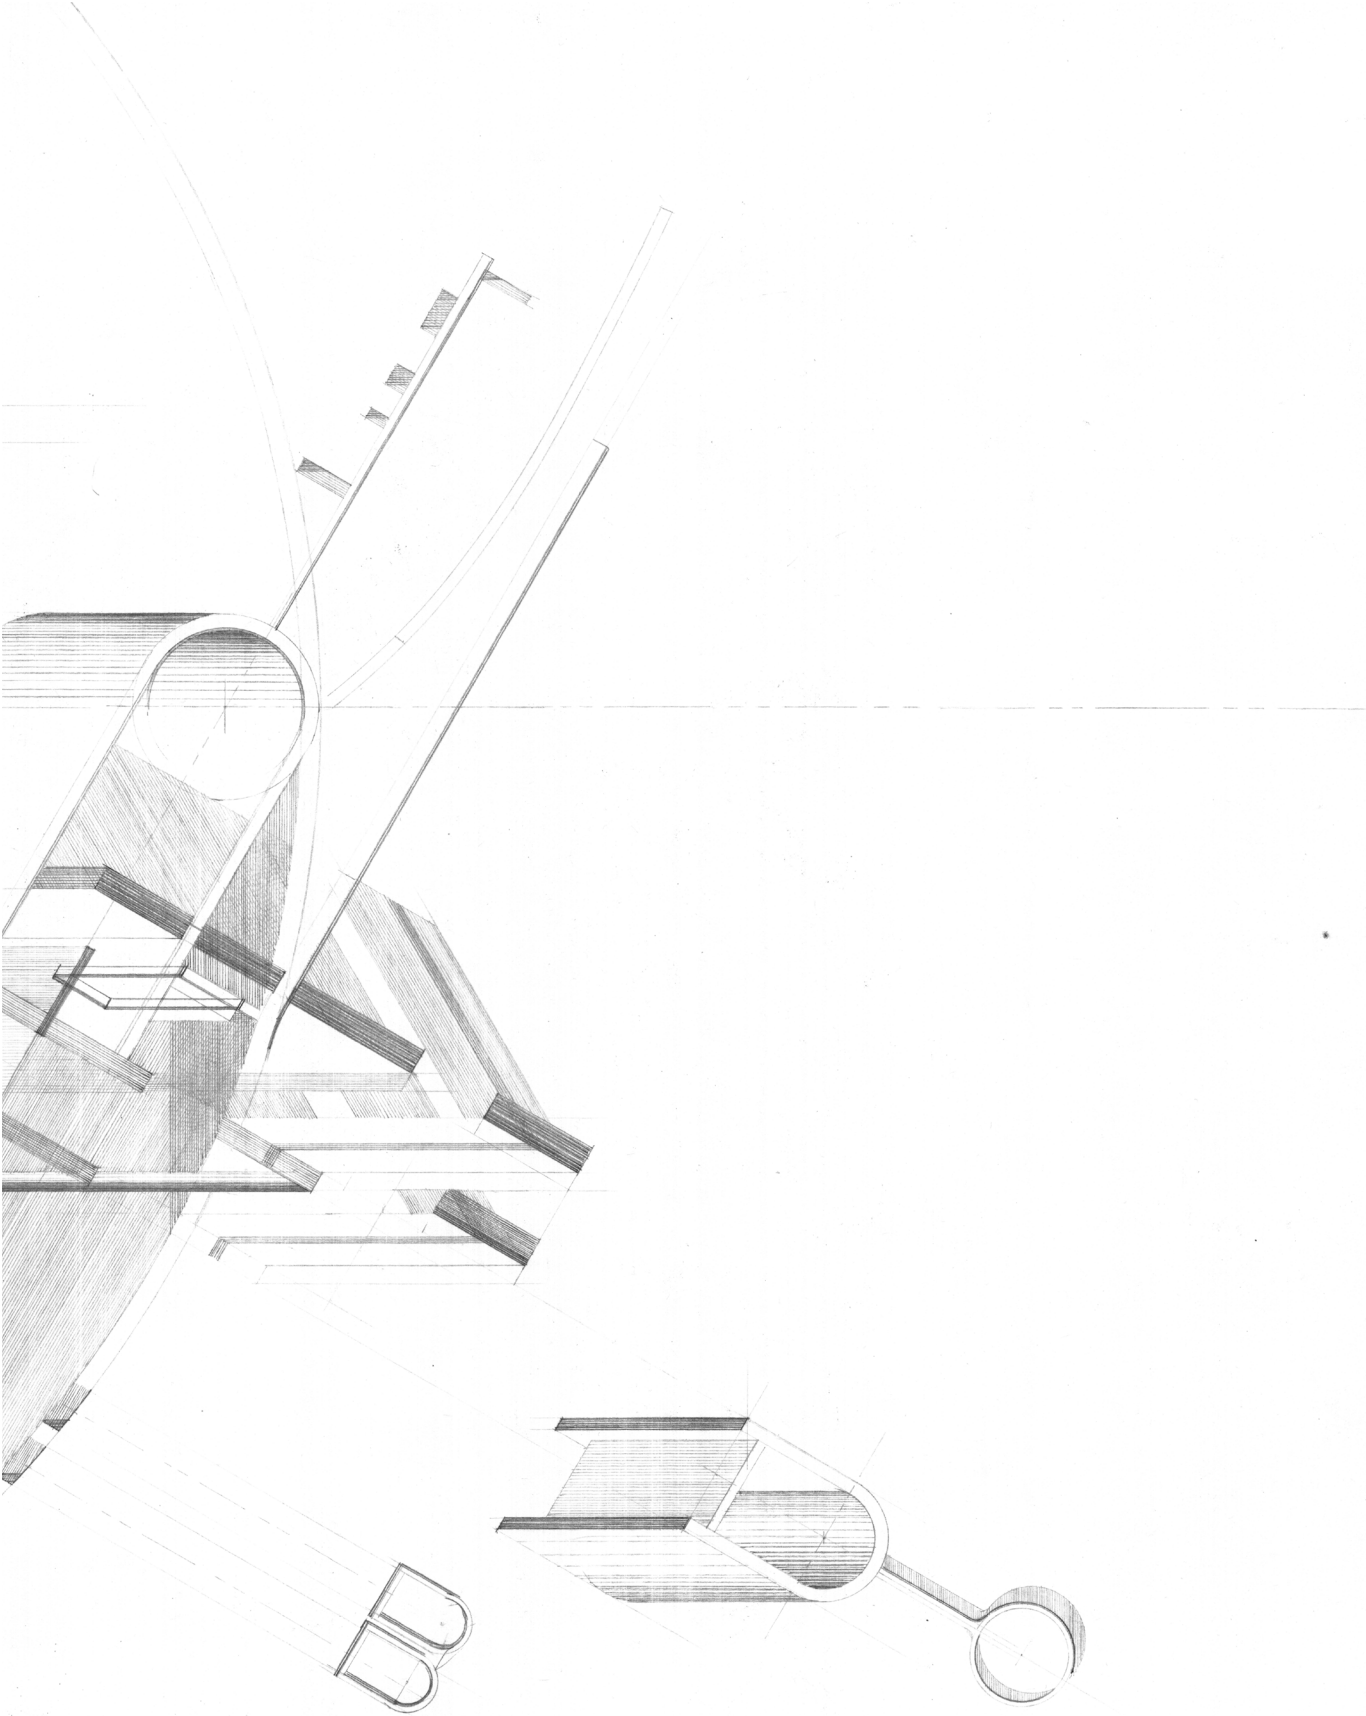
First drawn iteration applies the practice of tracing to construct the worm's eye view. A piece of butter paper is taped over the plan, as elements from the house plan, sections and roof plan are collated, and extended through the drawing process.
